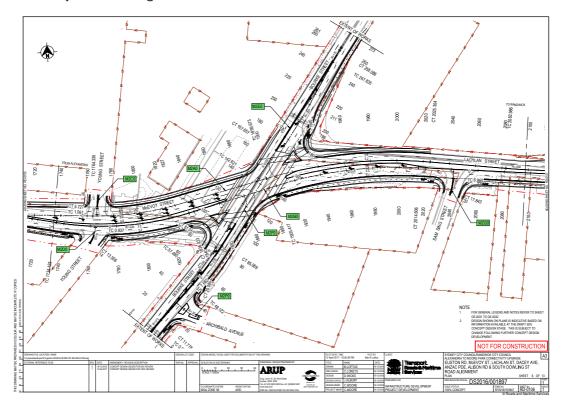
Preliminary Design of McEvoy and Bourke Street intersection (Source: RMS)
